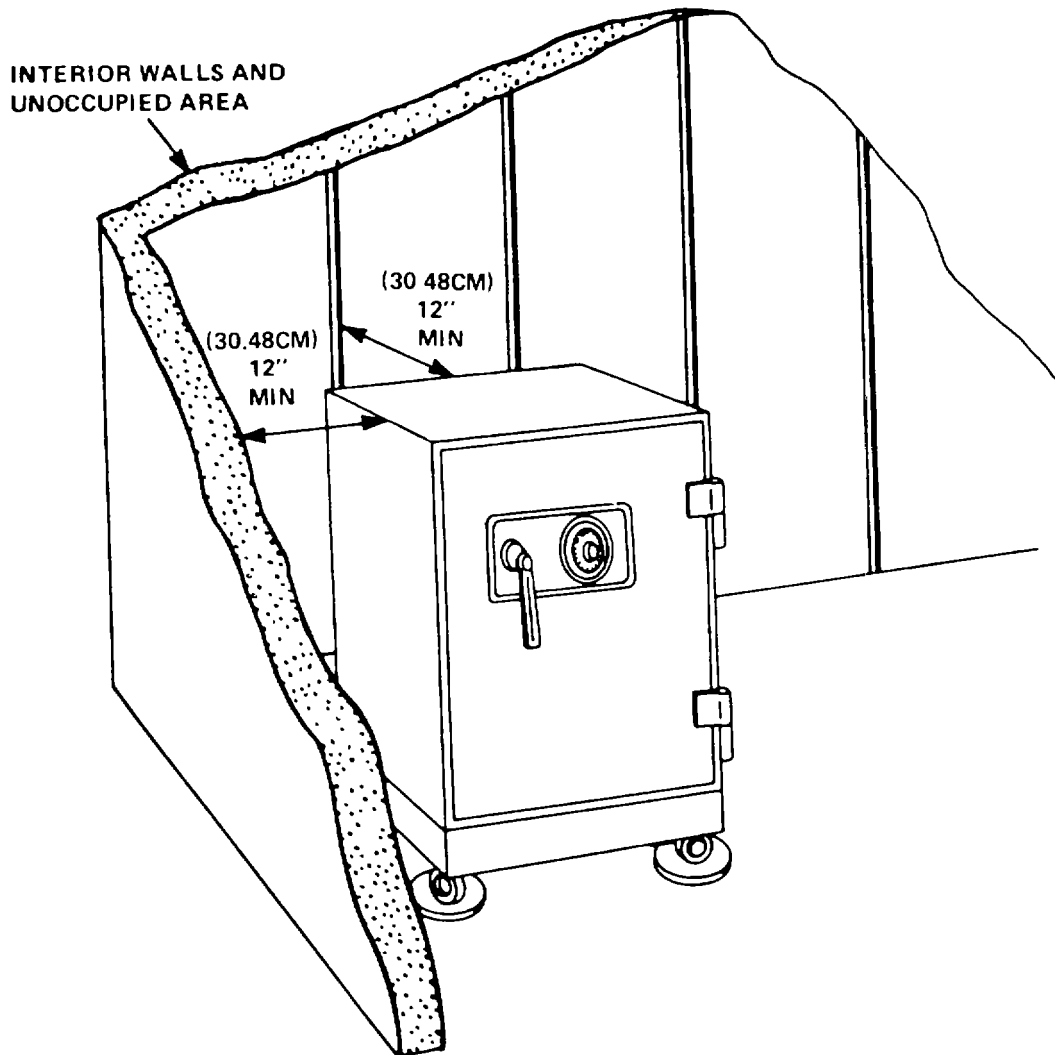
Minimum Spacing Between Wall and Safe (Without Ground Screen)
